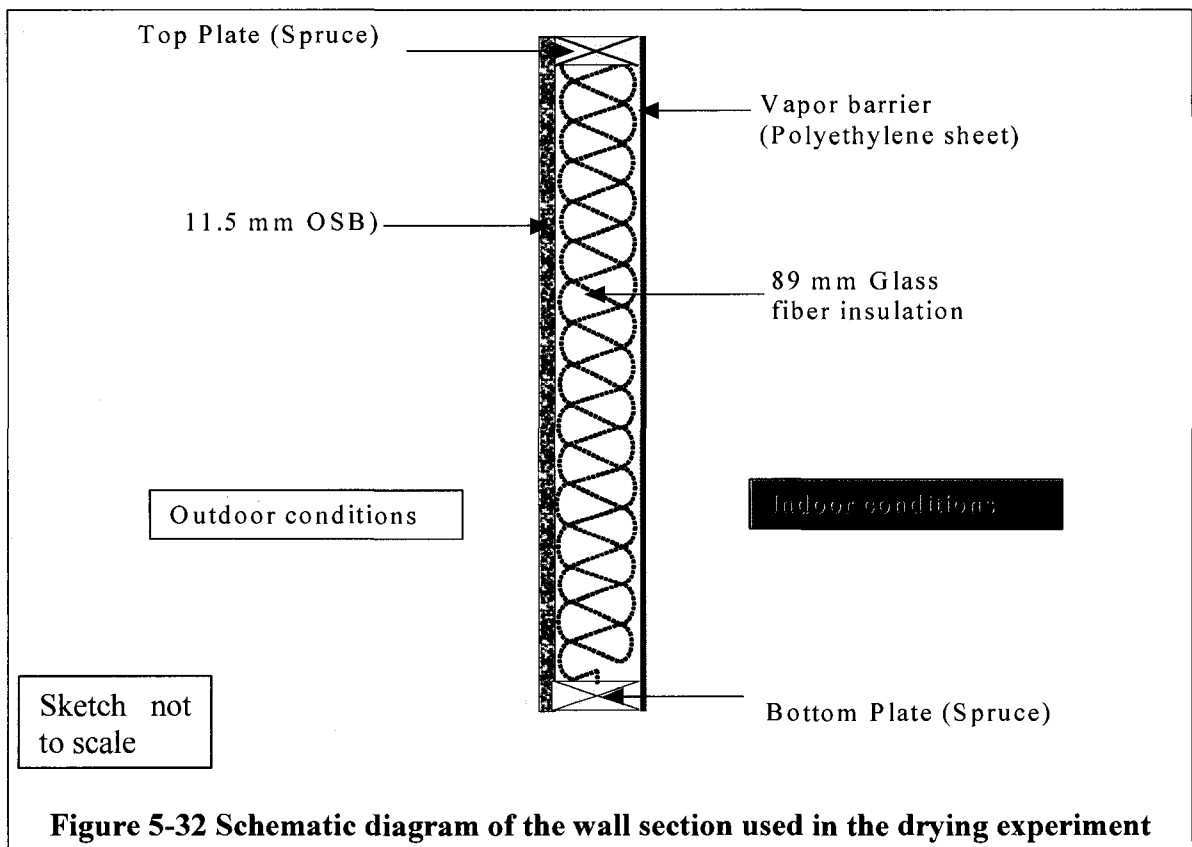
Schematic diagram of the wall section used in the drying experiment
